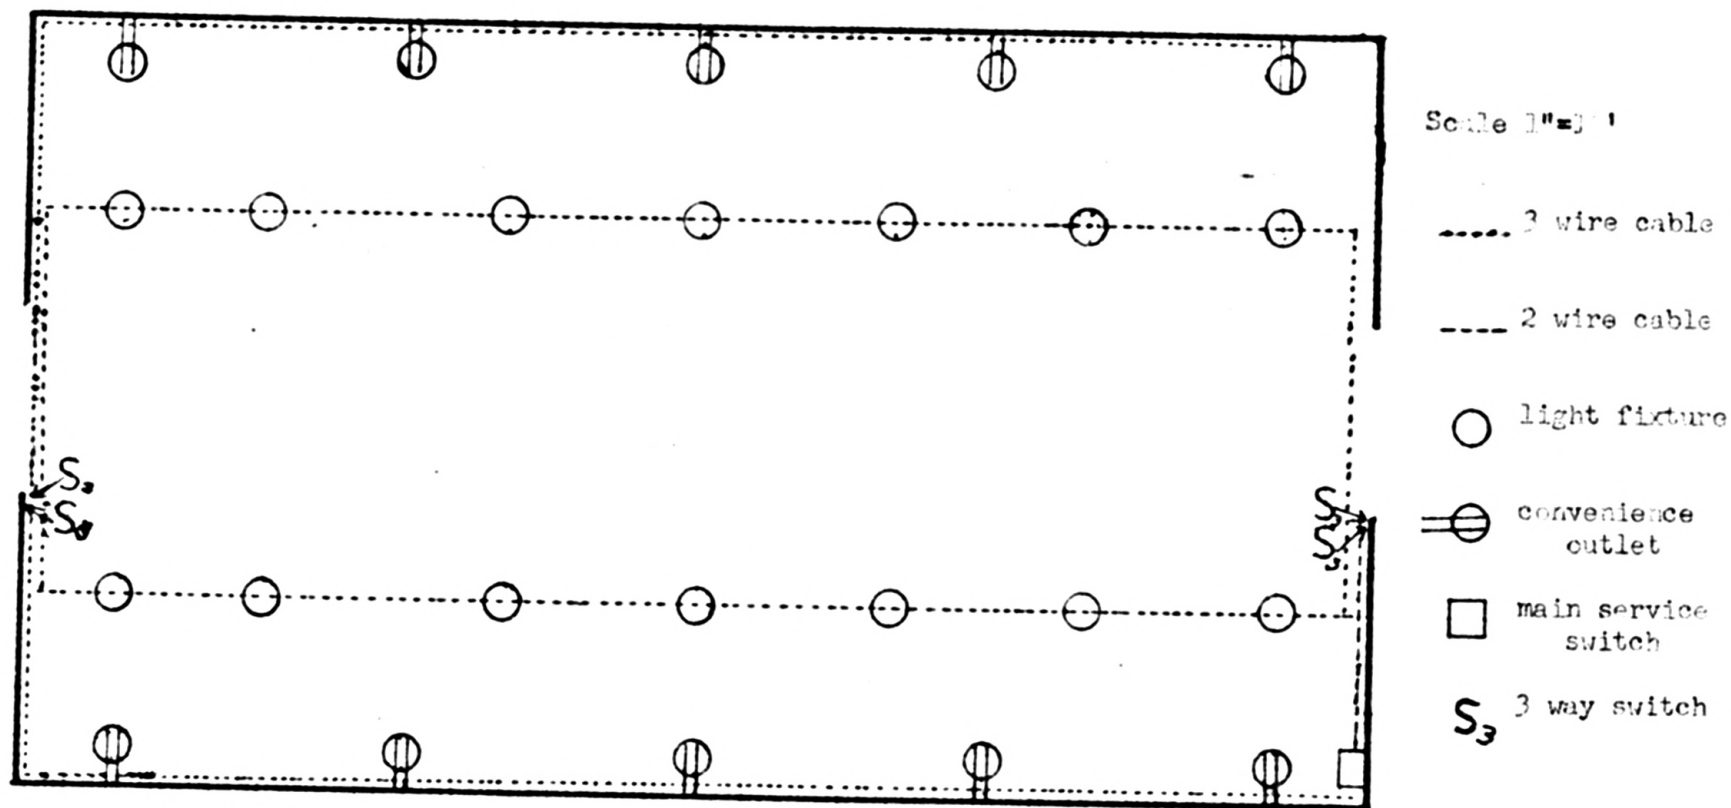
A diagram showing the wiring system for a 40' by 70' open-front laying house adapted for floor plan operations with litter.
